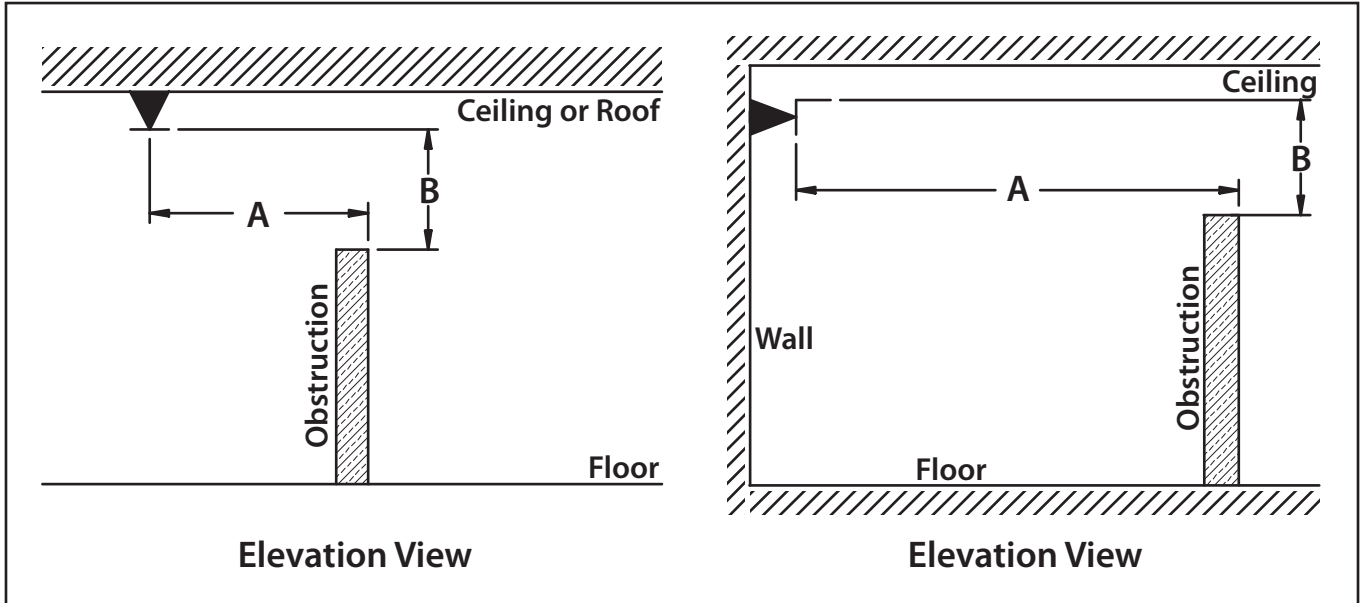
Minimum Distance from Obstruction (Residential Sidewall Sprinklers)
